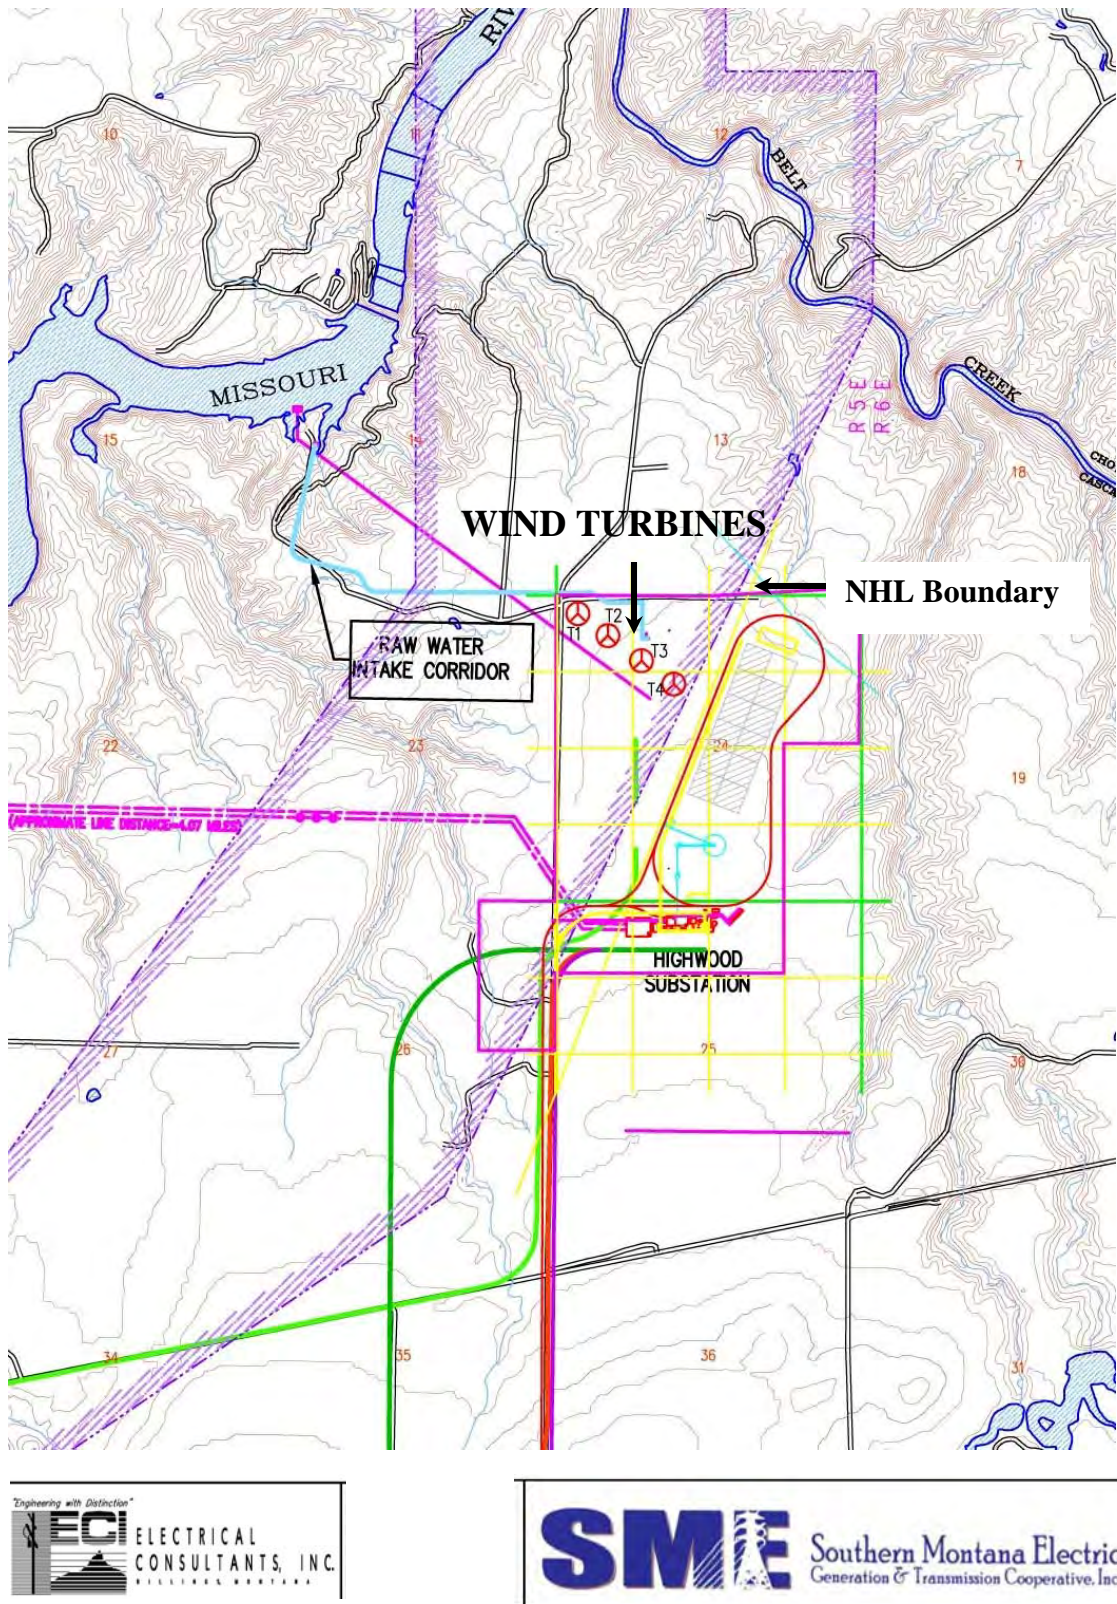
Preliminary HGS Wind Turbine Site Plan
